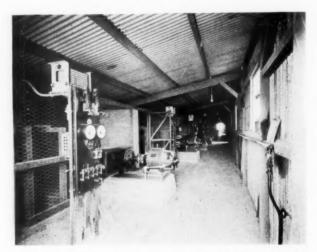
Motor generator sets. Rectifiers. Electrical equipment. Air valves for controlling air hammer
